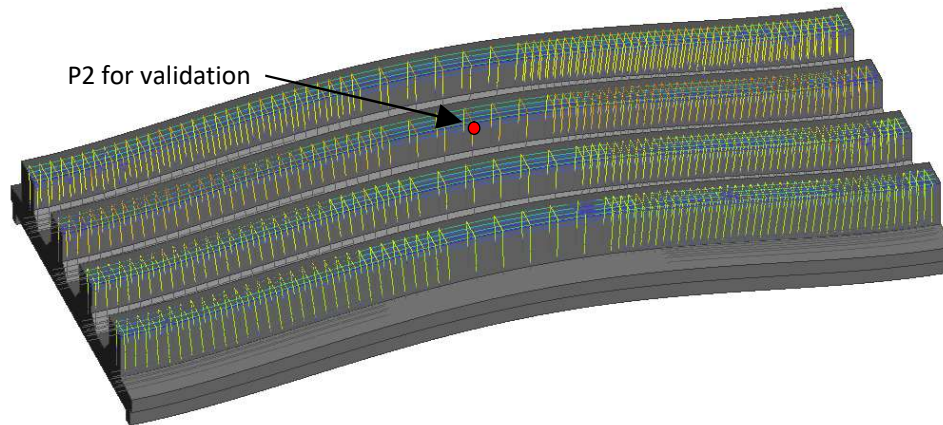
Deformed shape of the bridge section with the reinforcement model, bottom view of the model
